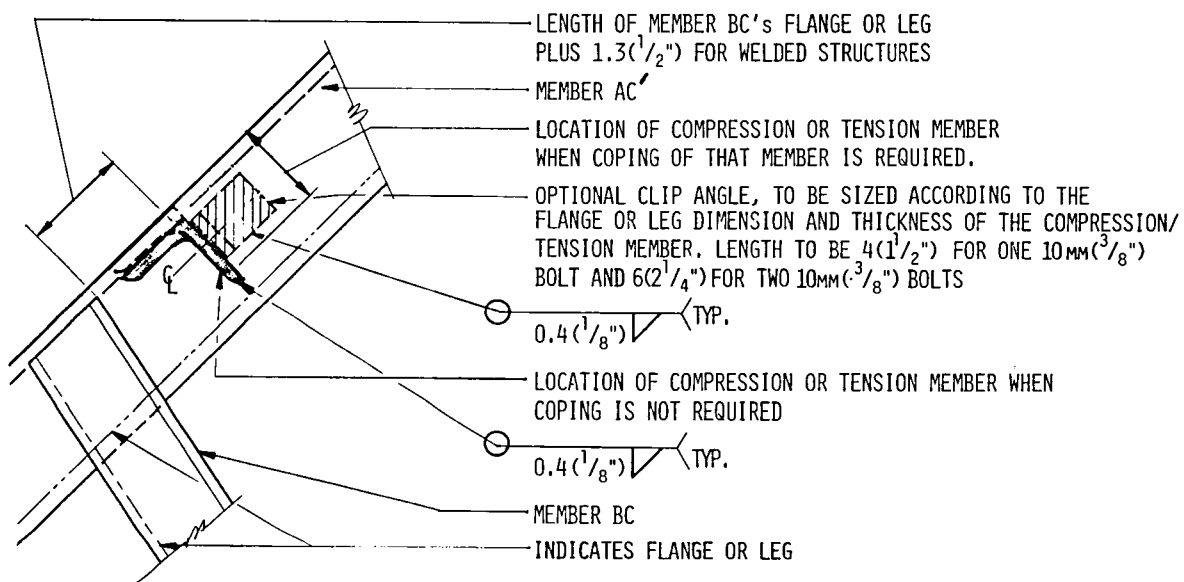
A. Horizontal Bracing Strut Connection Detail Type 1 for
